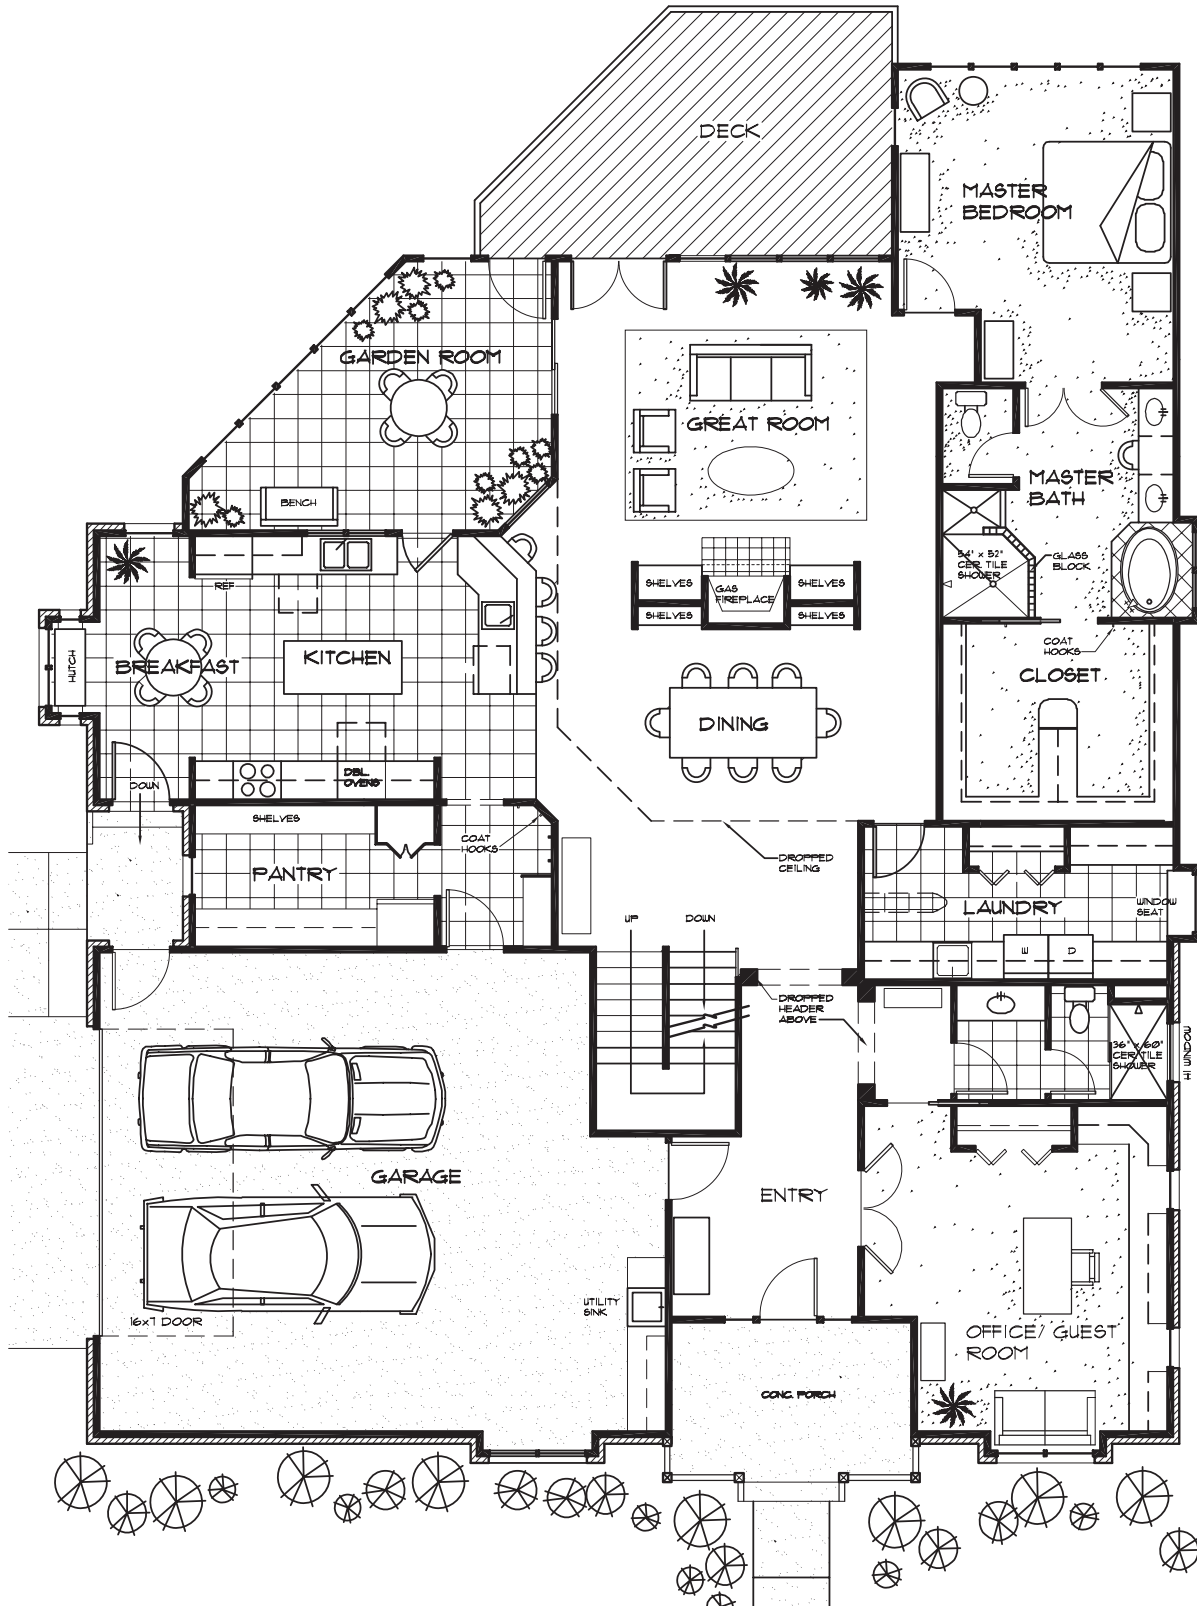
Design drawings can also show more detail in the form of plan views of a building.
